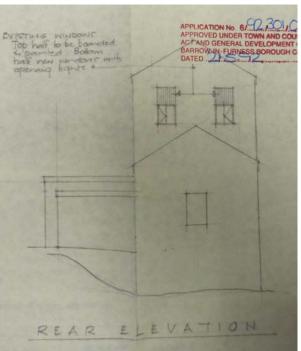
(left): Proposed new window in the west elevation for 1992 application
